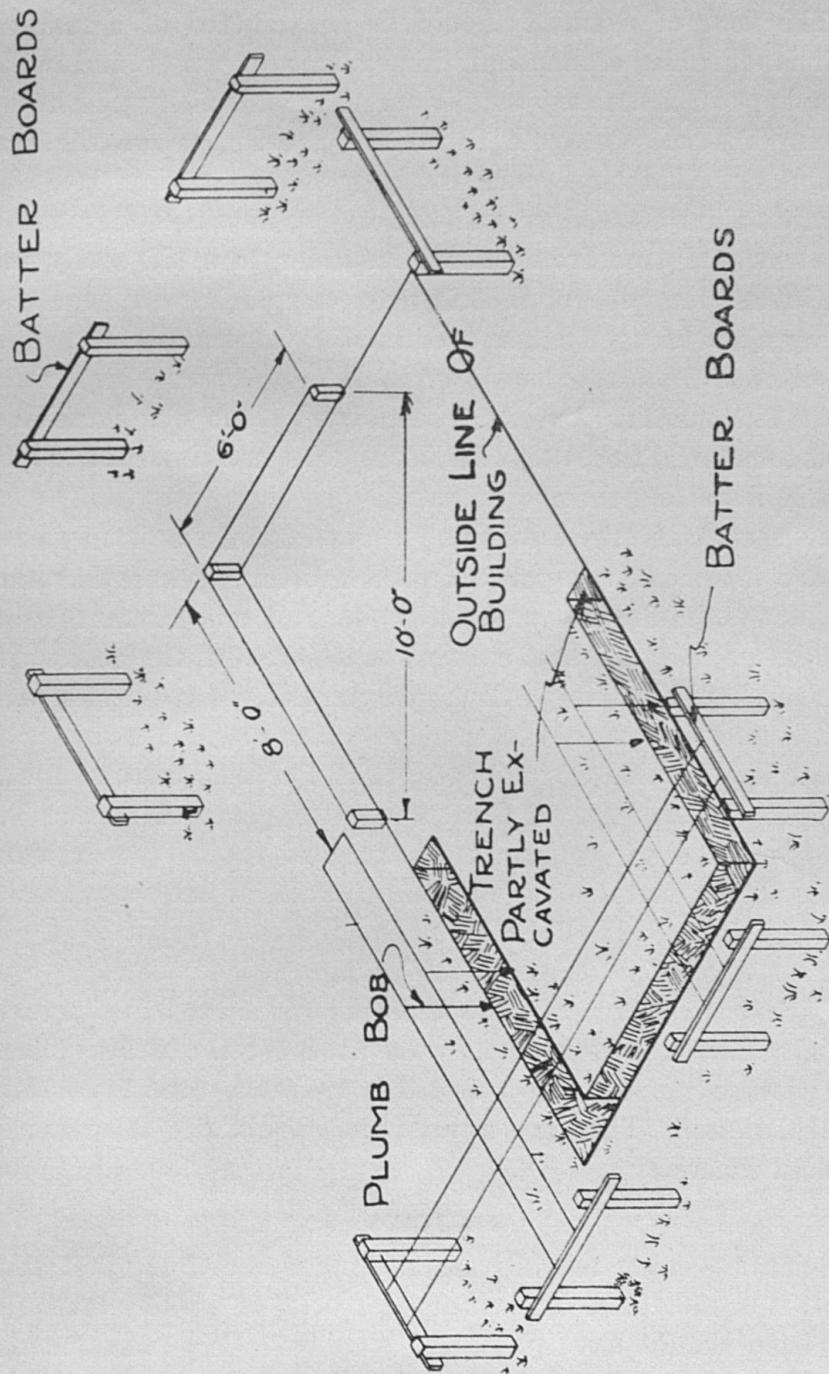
Fig. II. Method of squaring up corners and of using batter boards to establish building and excavation lines for foundation trench.
